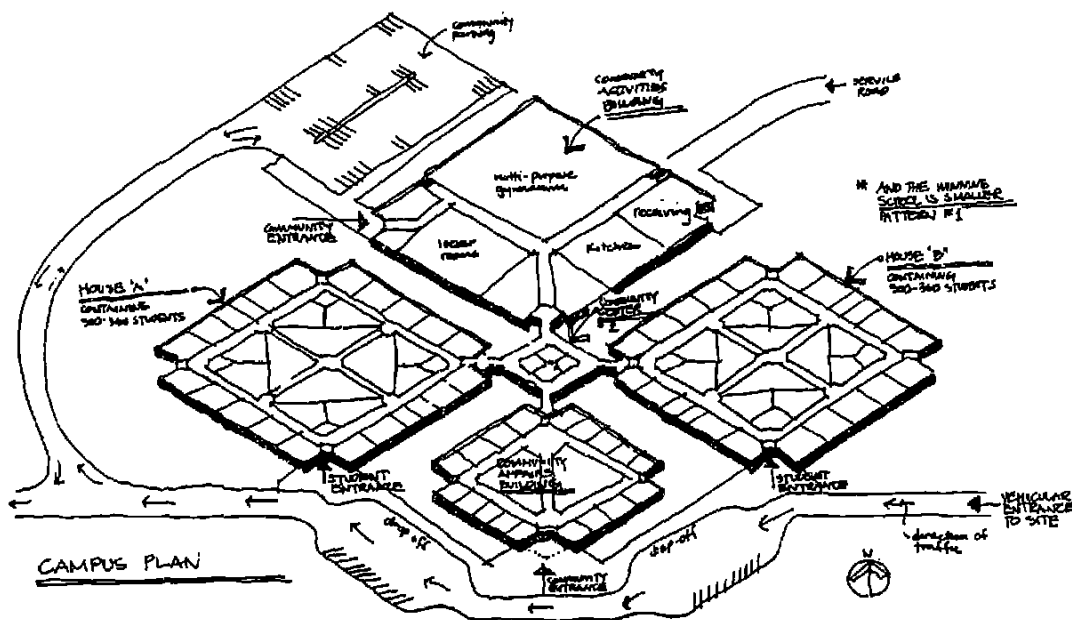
Campus plan--Alternative 1: Decentralized plan.
